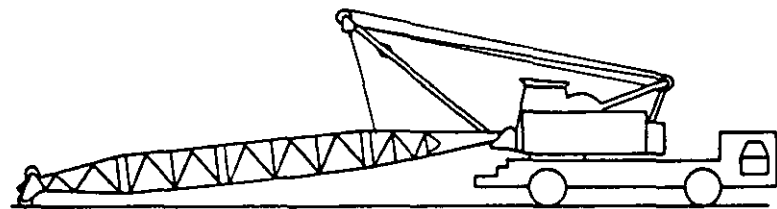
Truck-mounted strut-boom crane arranged for travelling on a highway
